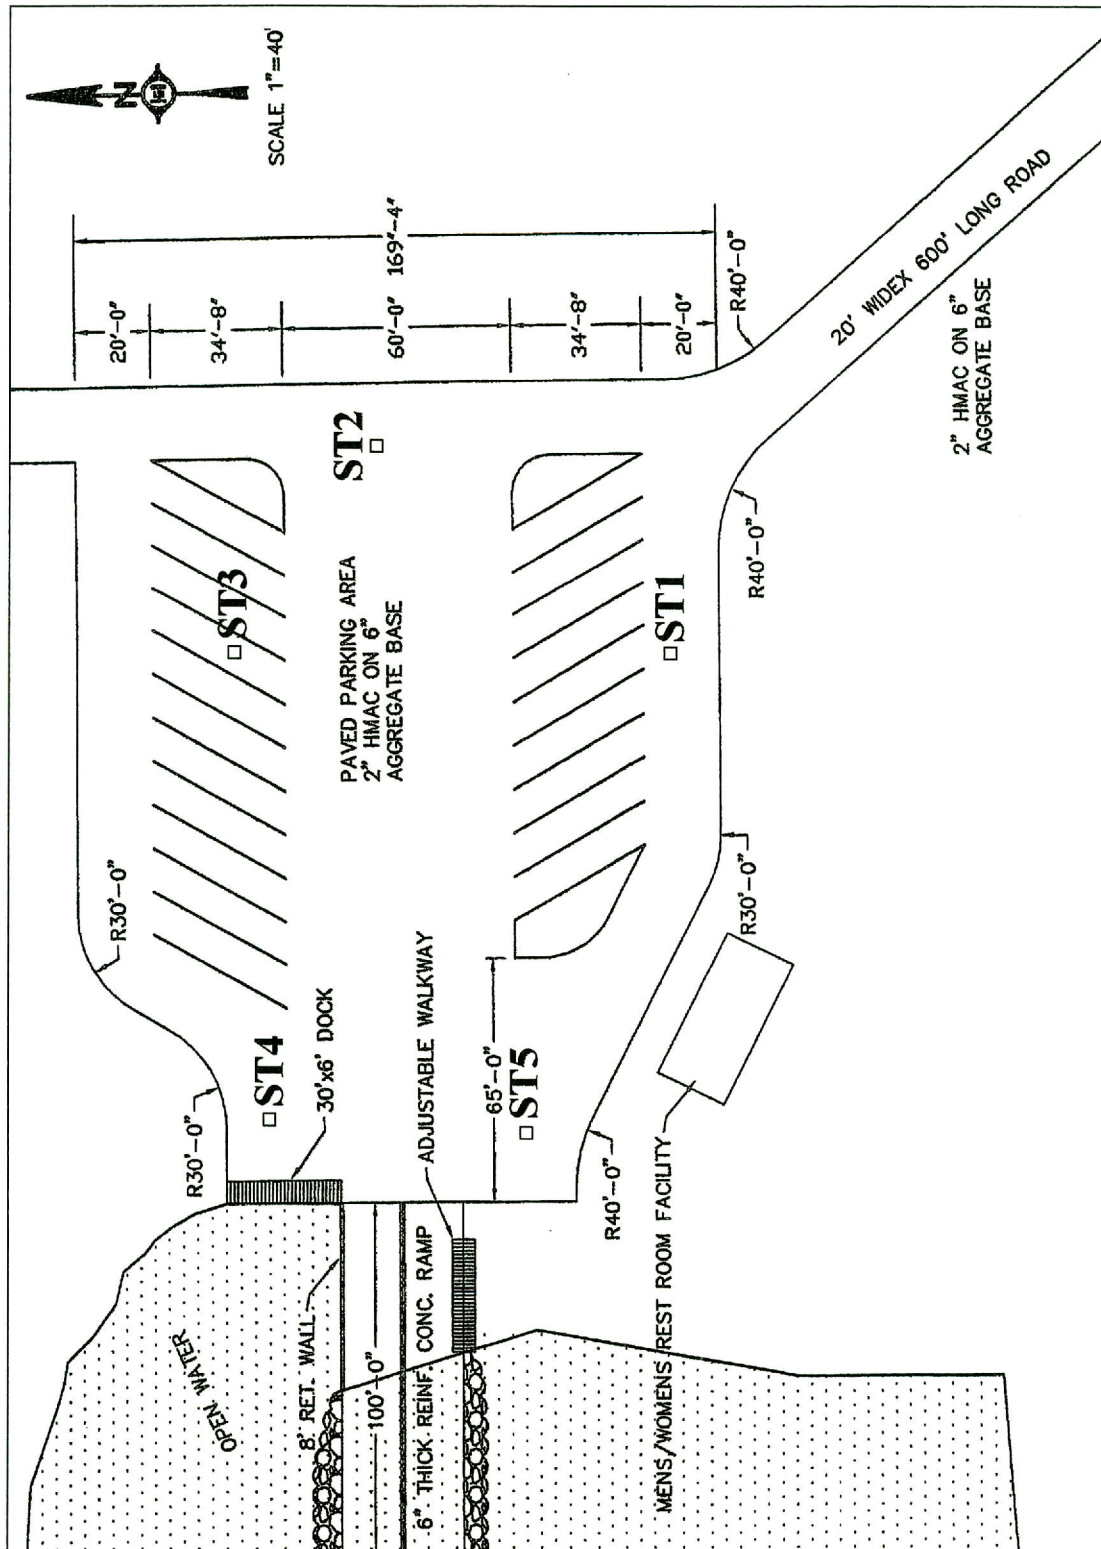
Shovel test locations plotted on a plat of the proposed boat ramp, parking lot and bathroom facilities provided by ECS.
